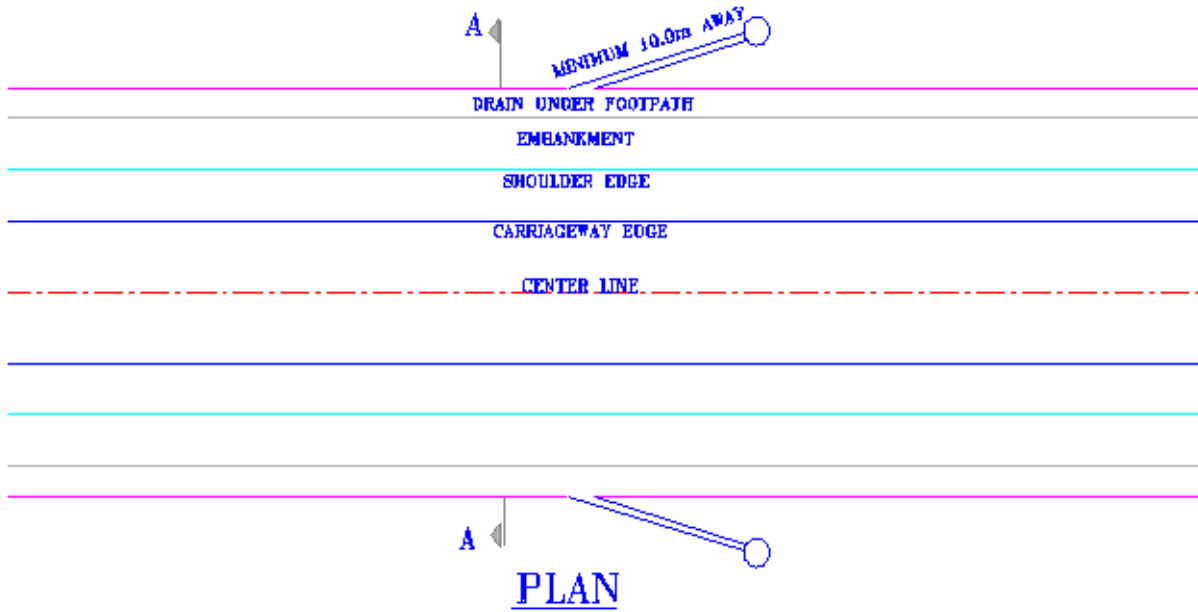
Conceptual Plan of Diversion at Bridge Location
